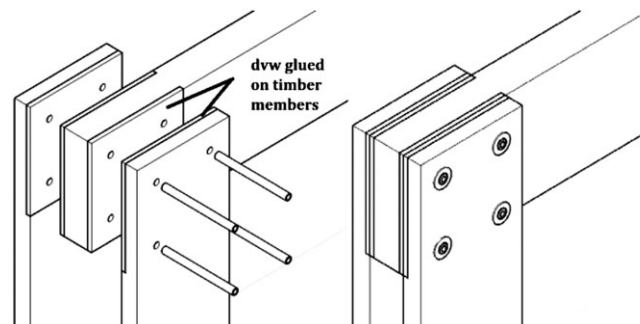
Densified veneer wood (DVW) reinforced timber connection with expanded tube fasteners before (left) and after (right) the assembly.
